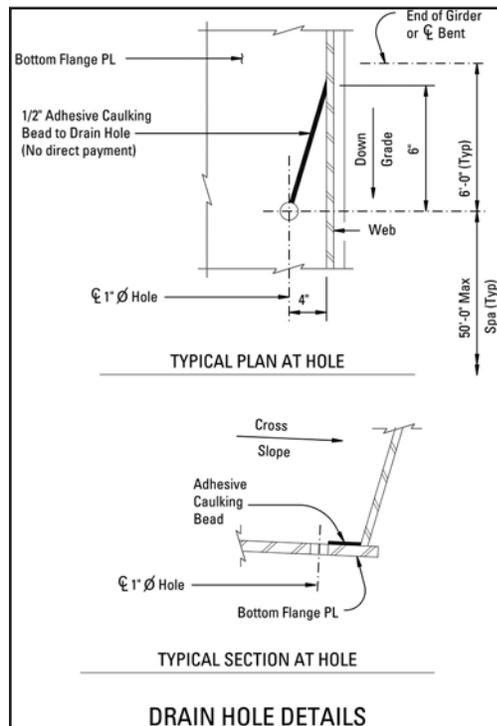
Suggested details for drain holes in tub girder bottom flanges.
